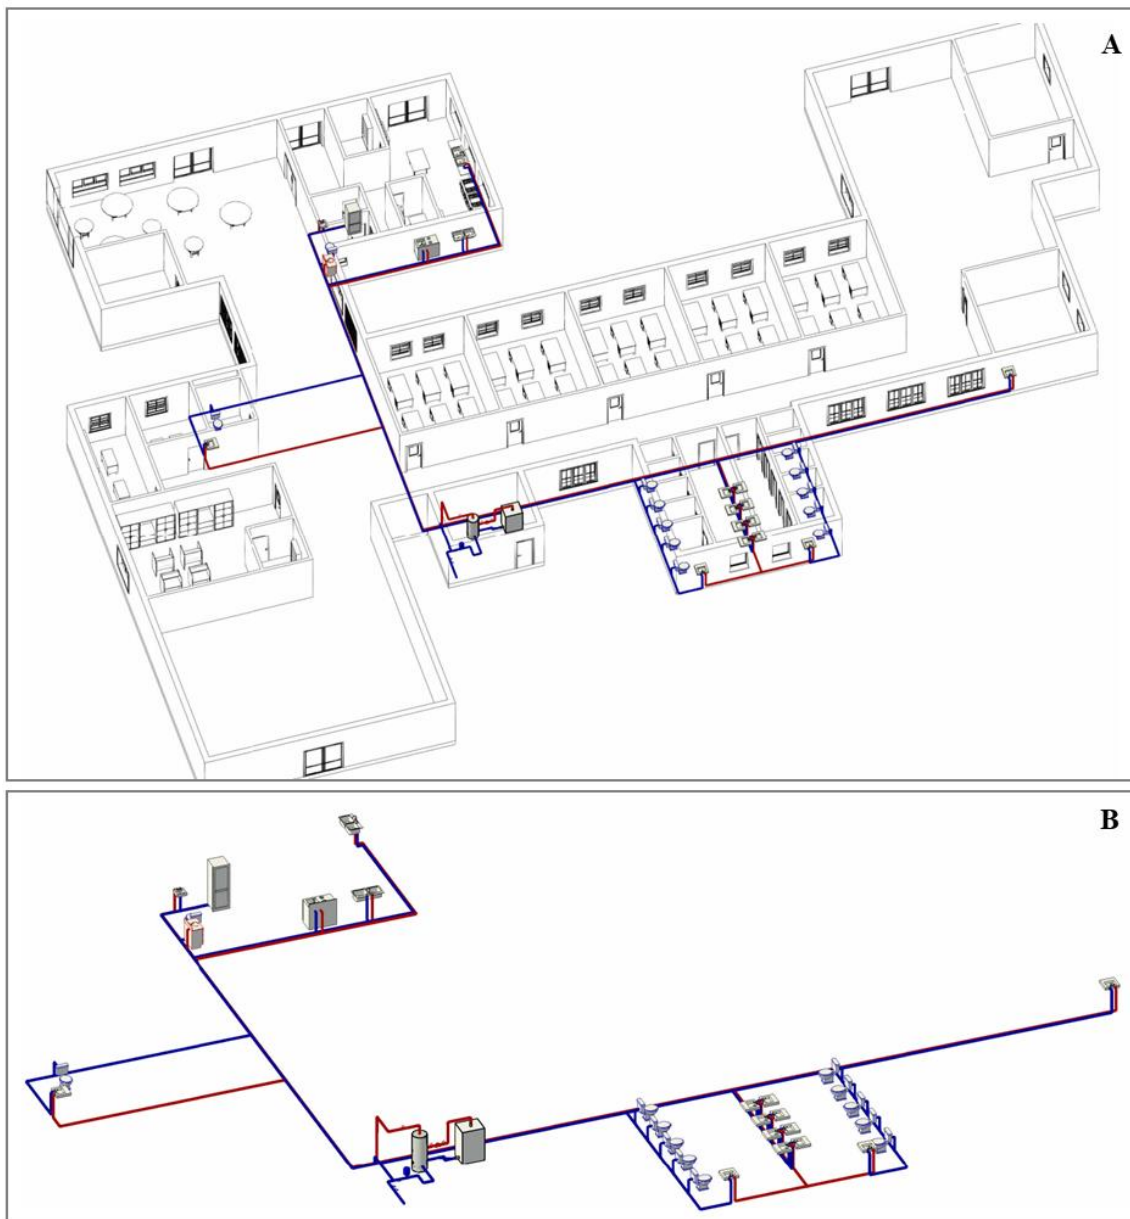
Building 1: A) building plumbing linked to the architectural model and B) building plumbing.
